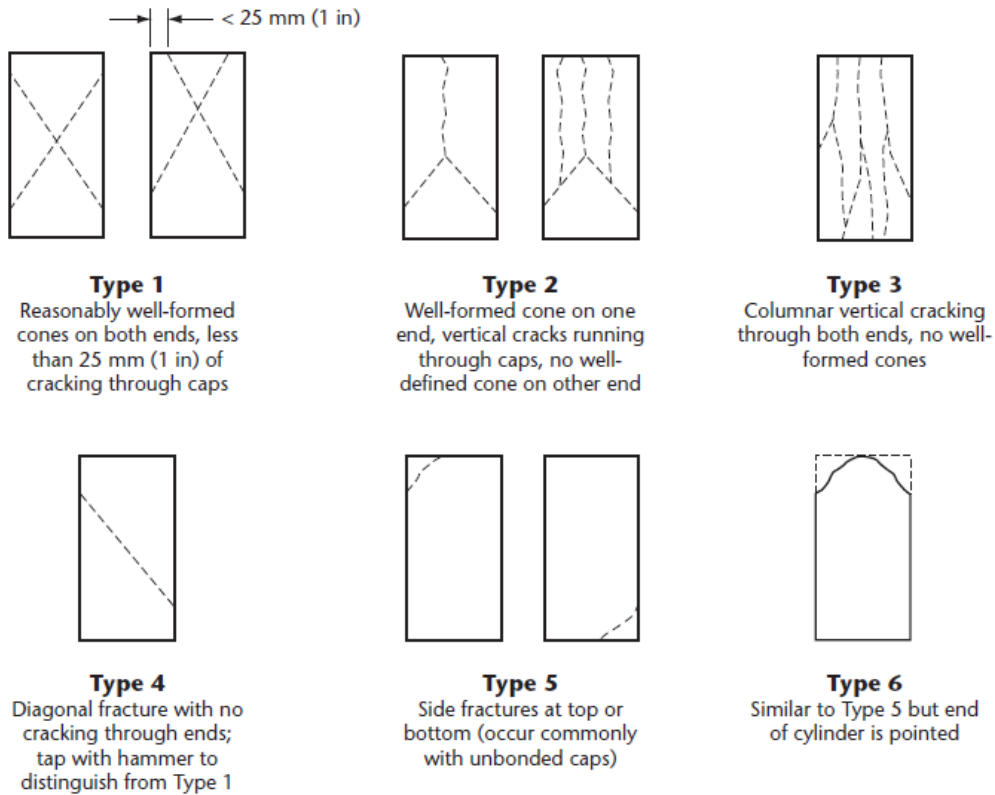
Sketches of types of fracture of cylindrical concrete cylinders loaded under uniaxial compression (excerpted from CSA A23.2-9C, 2009)
